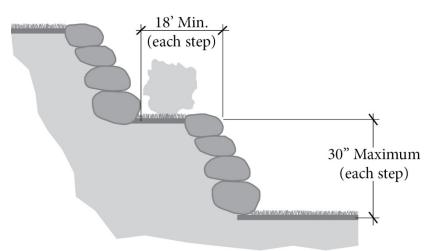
F.2.a. Allowable terrace configuration for wall or rockery adjacent to a public sidewalk. Note that this illustration shows a stone wall but other masonry and concrete walls are acceptable as well.
